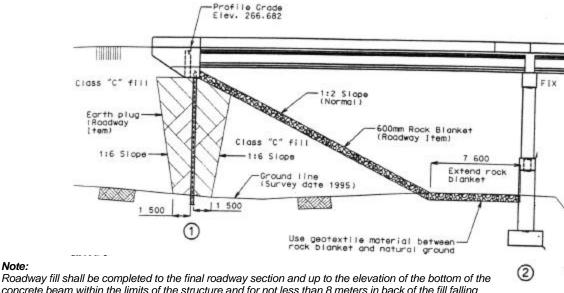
Typical Cross-section of a bridge abutment in longitudinal direction
